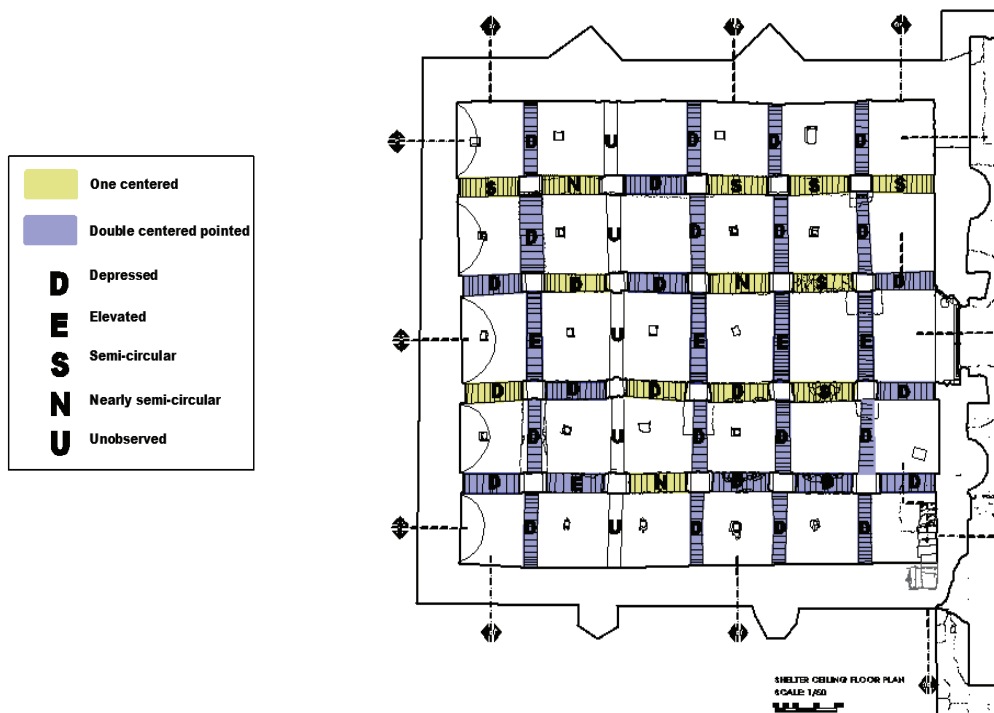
Vault and arch profile types, reflected ceiling plan
